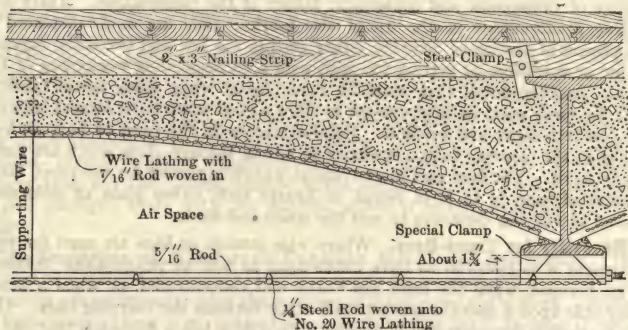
Roebling Segmental Concrete Floor-arch. Type 1
